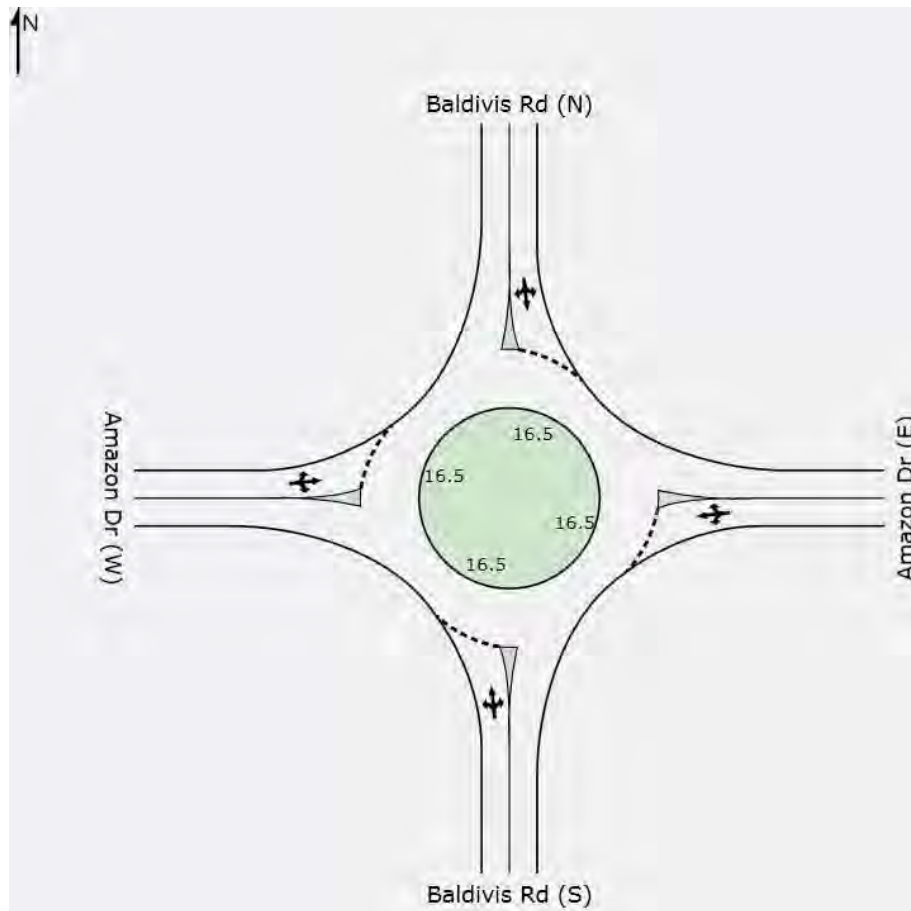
Baldivis Road / Amazon Drive roundabout proposed layout
